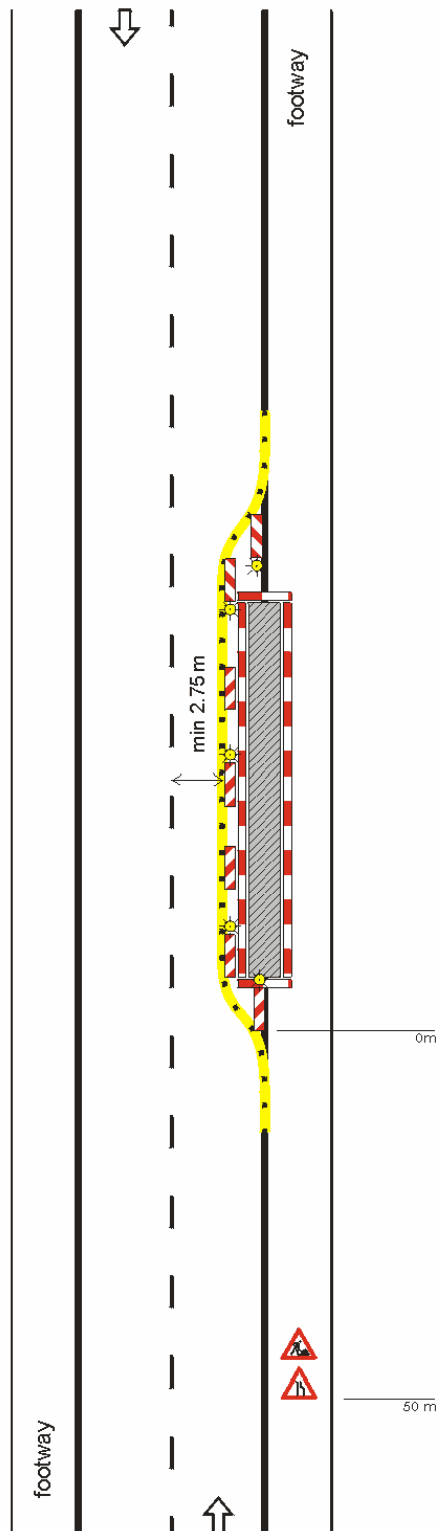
Example of situation "C.1.a" (rural secondary road, long-term, lane narrowing)
